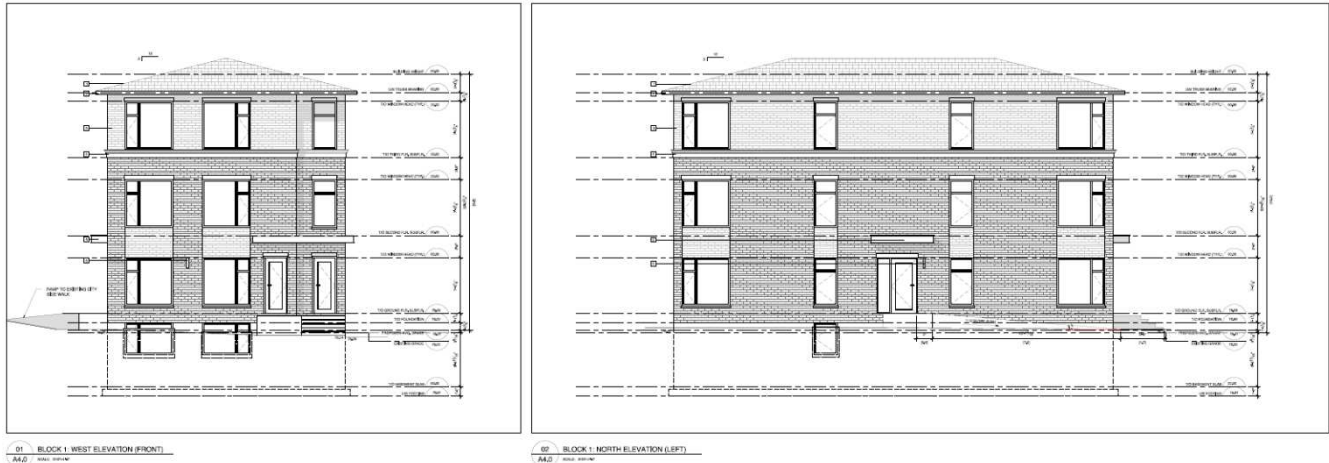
Lot 1 West (Front) Elevation and North (Left) Elevation
